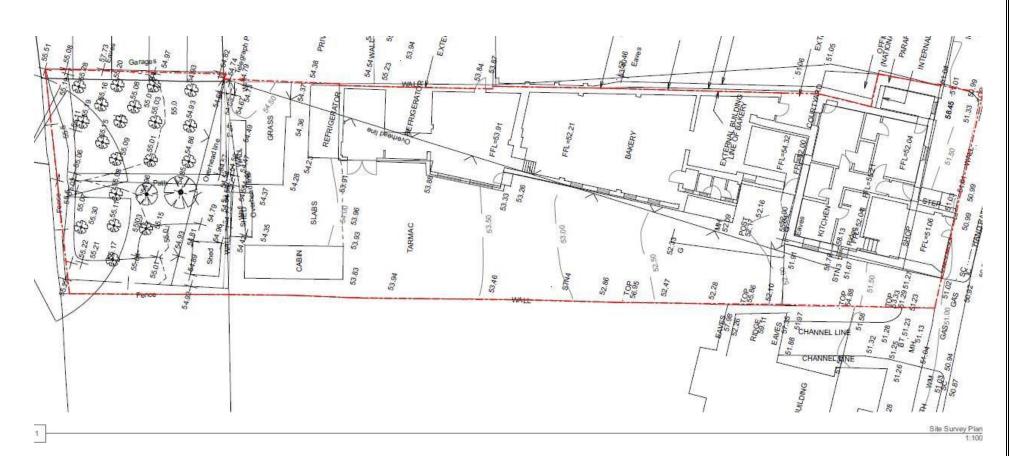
Plans of the building complex at 2-64 St John's Road prior to development
